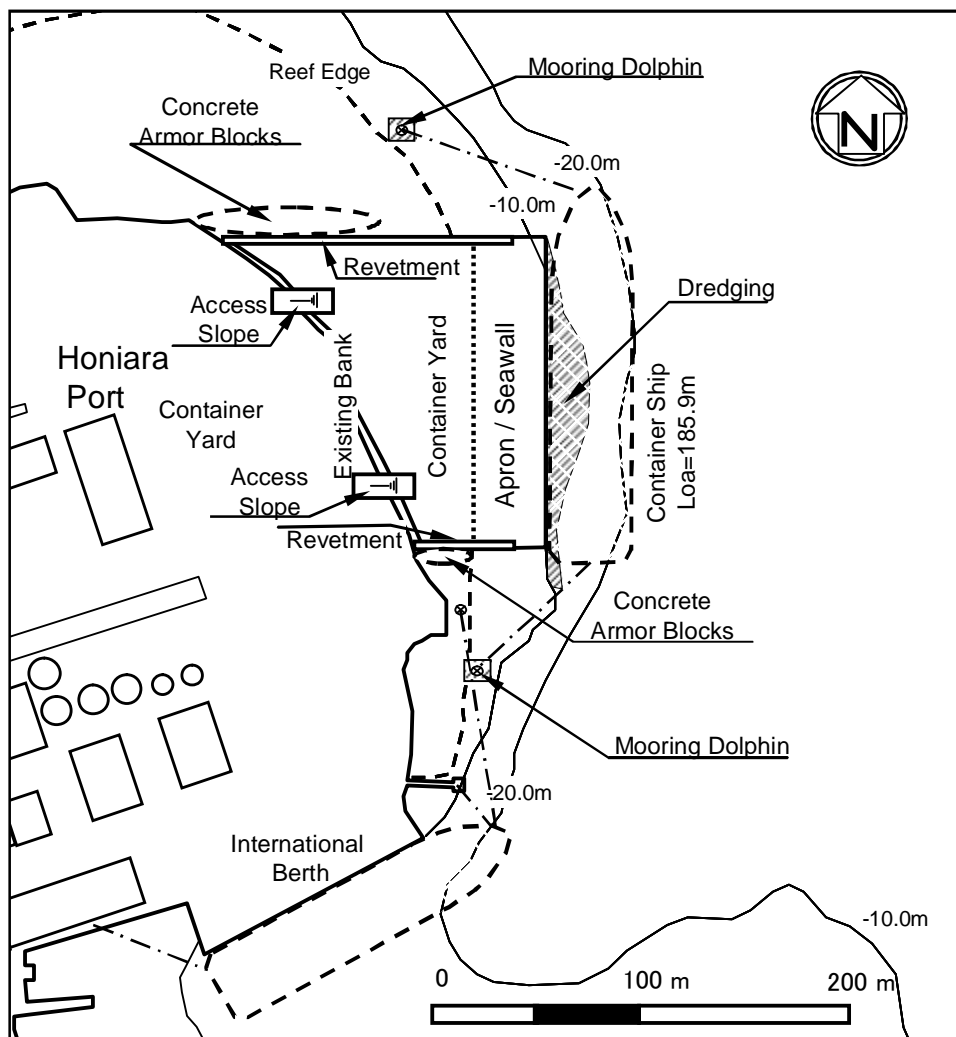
Schematic Layout Plan of New International Wharf
